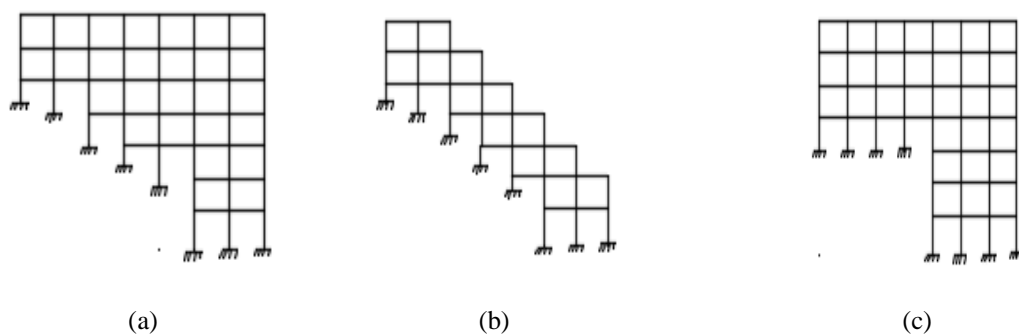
(a) Step back (b) step back-set back (c) building on steep slope configuration
